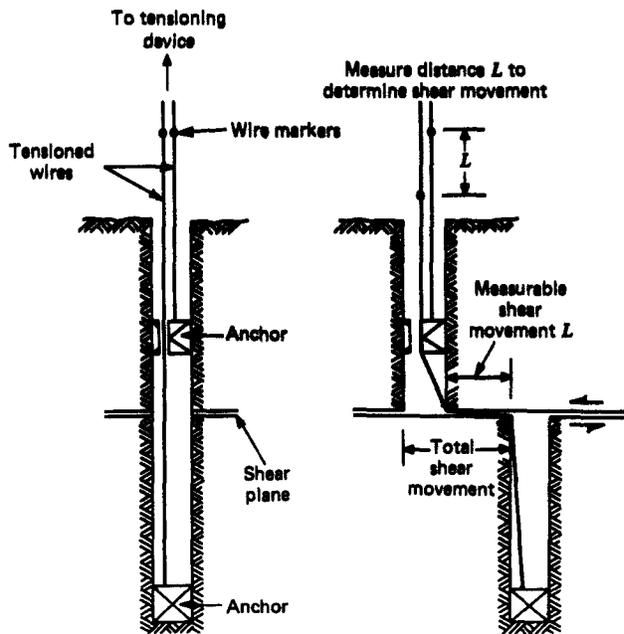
Schematic of slope extensometer (after Kirschke, 1977). Note: Additional anchors and tensioned wires not shown.
